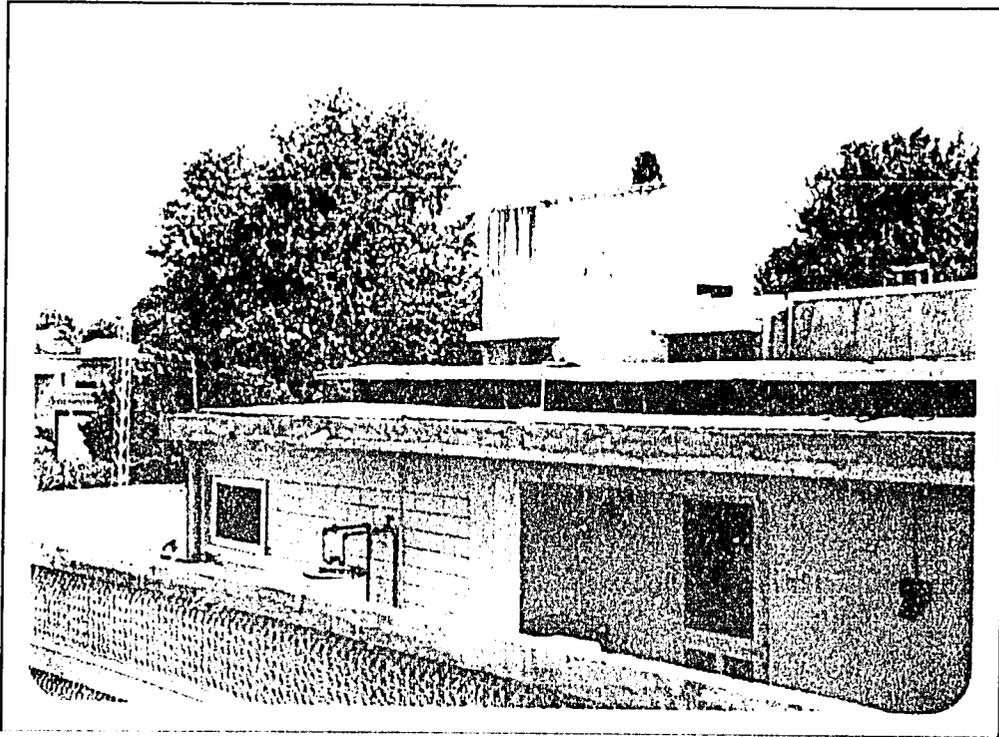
Peshawar DAI Office Facility. View of water tank adjacent to proposed equipment room viewed from front roof of building.
